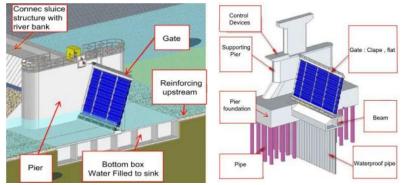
Caissons and Pier sluice structure applied in Vietnam
